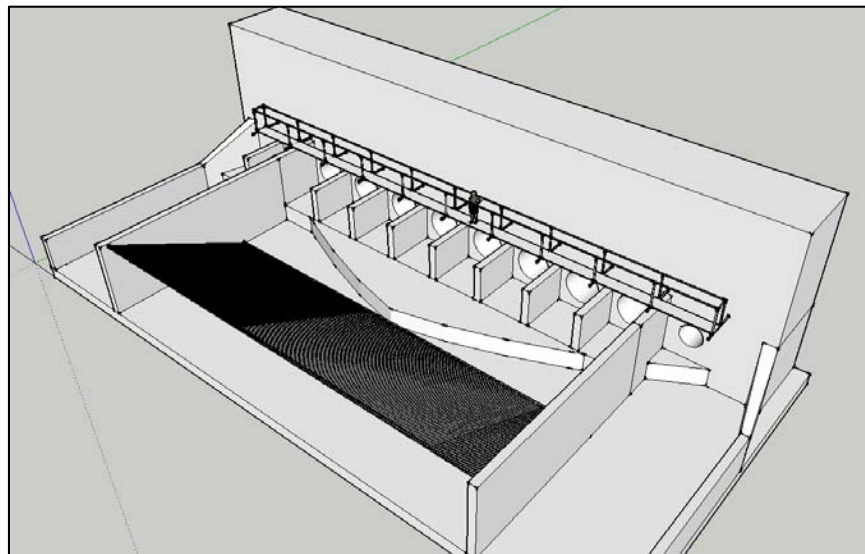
3-dimensional view of features on the downstream side of KLOG with two raised side walls and a picket weir at the base of the existing concrete bullnose.
